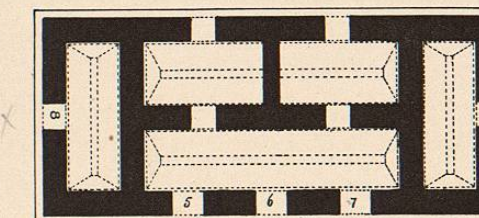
STRUCTURE 1: GROUND-PLAN.
